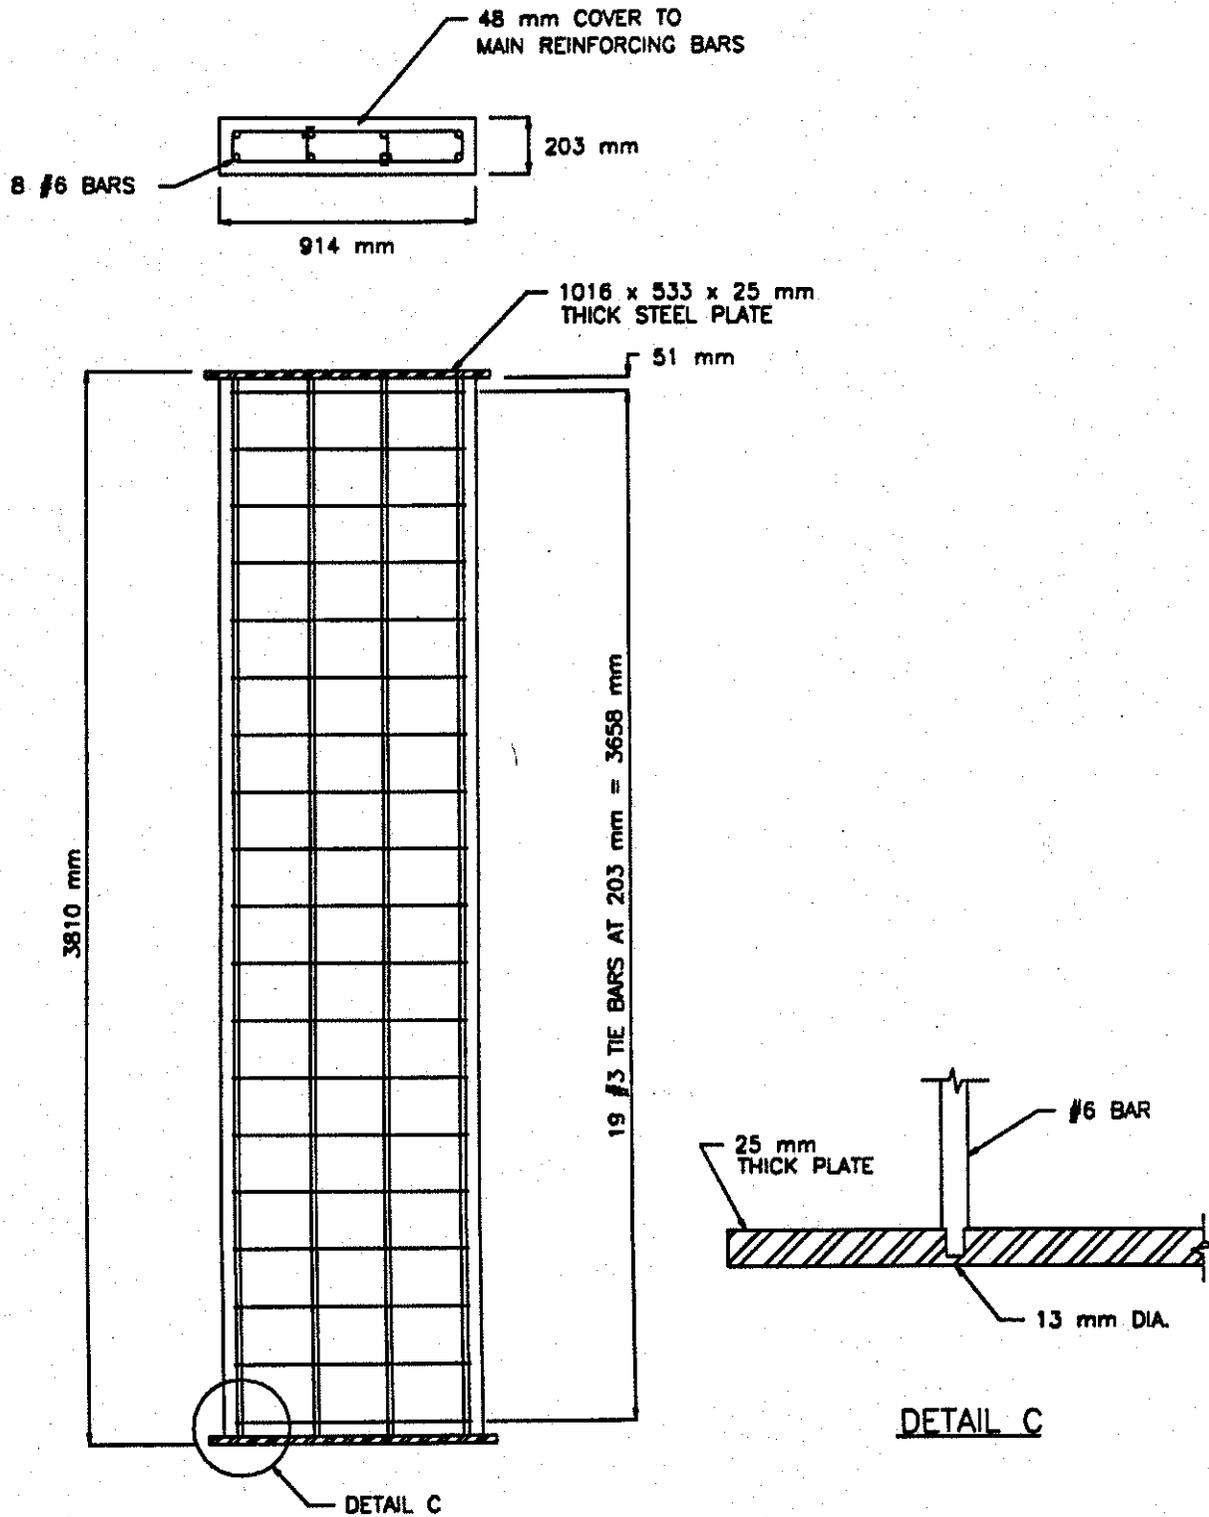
ELEVATION, CROSS-SECTION AND FINISHING DETAIL:
